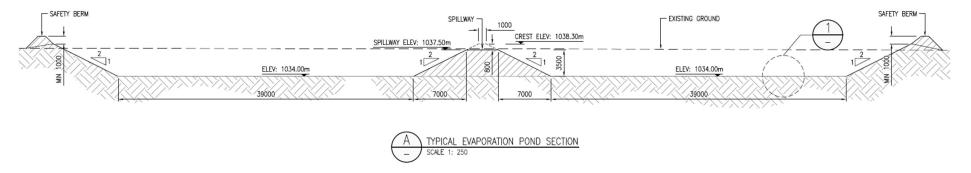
Typical Cross Section for Evaporation Pond Compartments
